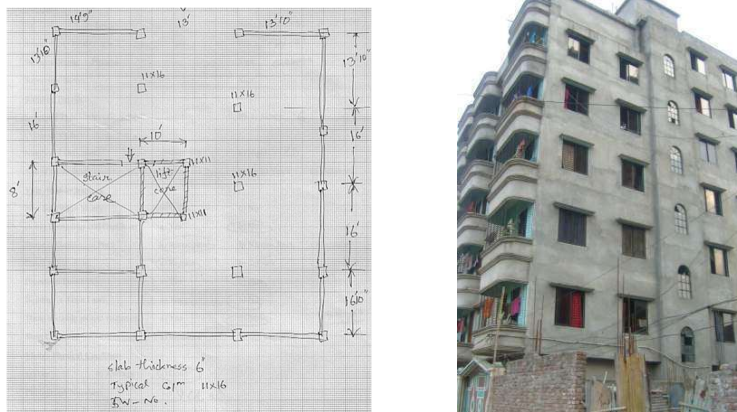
A typical As-built drawing for ground floor plan and photo of building (CDMP, 2009).
